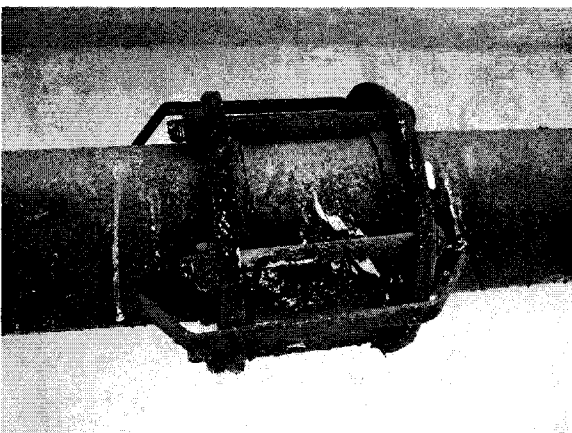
Washougal River Bridge Crossing: Close up view of as found condition of pipe supports.
